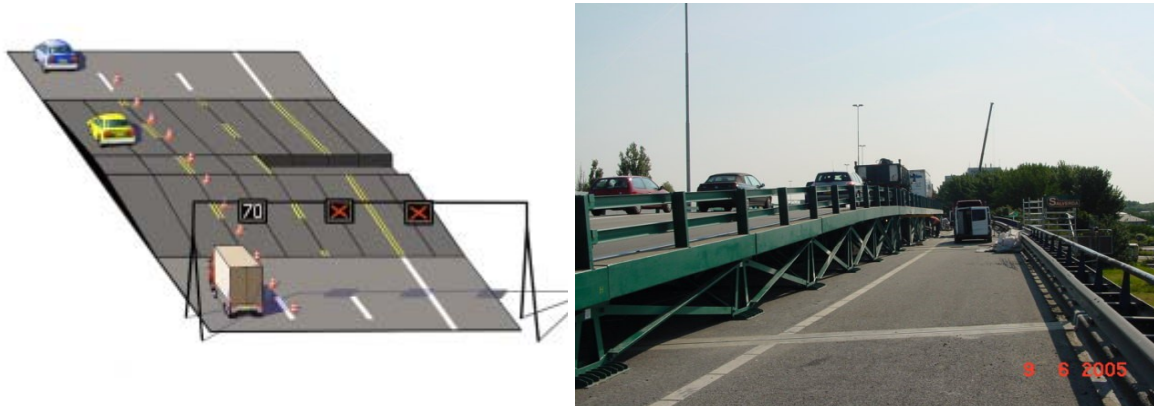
Temporary bridge structures for joint repairs and worker safety.
